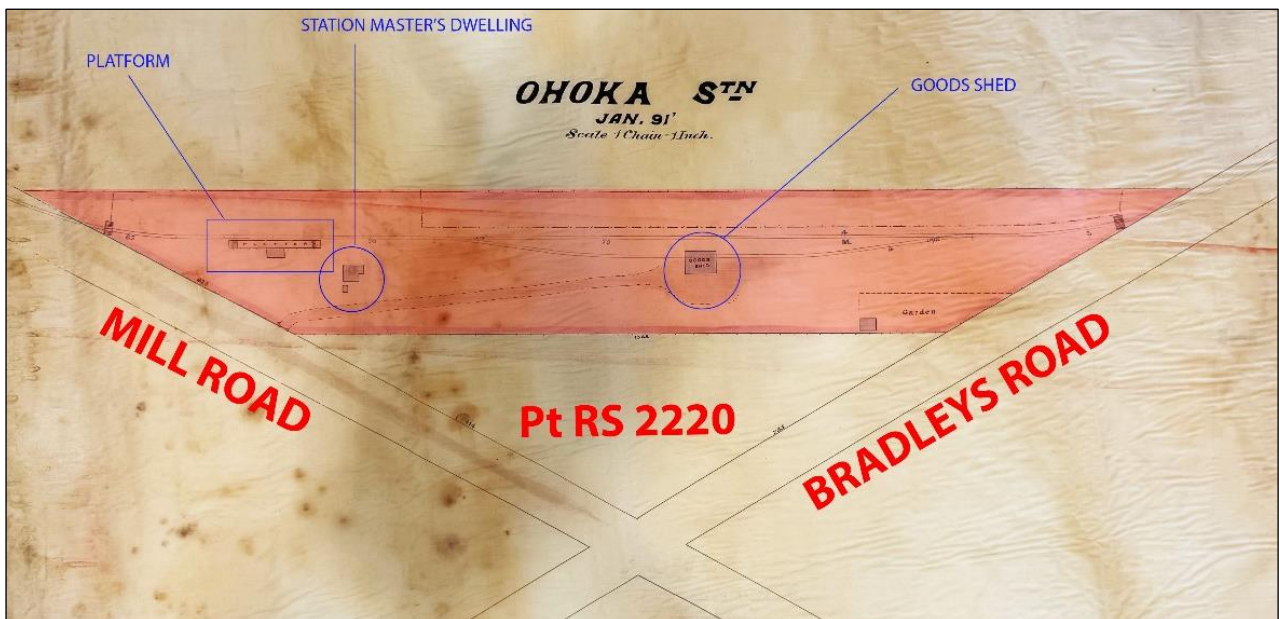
Detail from the plan of the Ohoka Railway Station (highlighted in red) in 1891. Outlined in blue are the locations of the platform, station master's house, and the goods shed. North is toward the bottom of the plan Image: Archives New Zealand, 1891.
